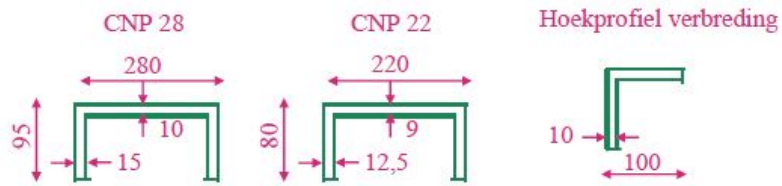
Cross- sectional properties of the deck bracing (Arup bv)
